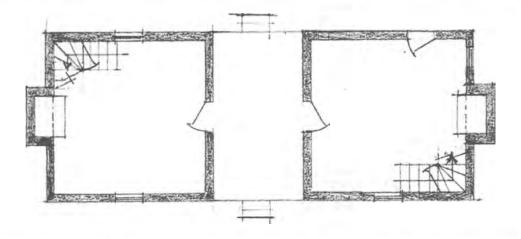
Conjectural first floor plan of the Noblit-Lytle House as built in the 1840s (R. Jones).
